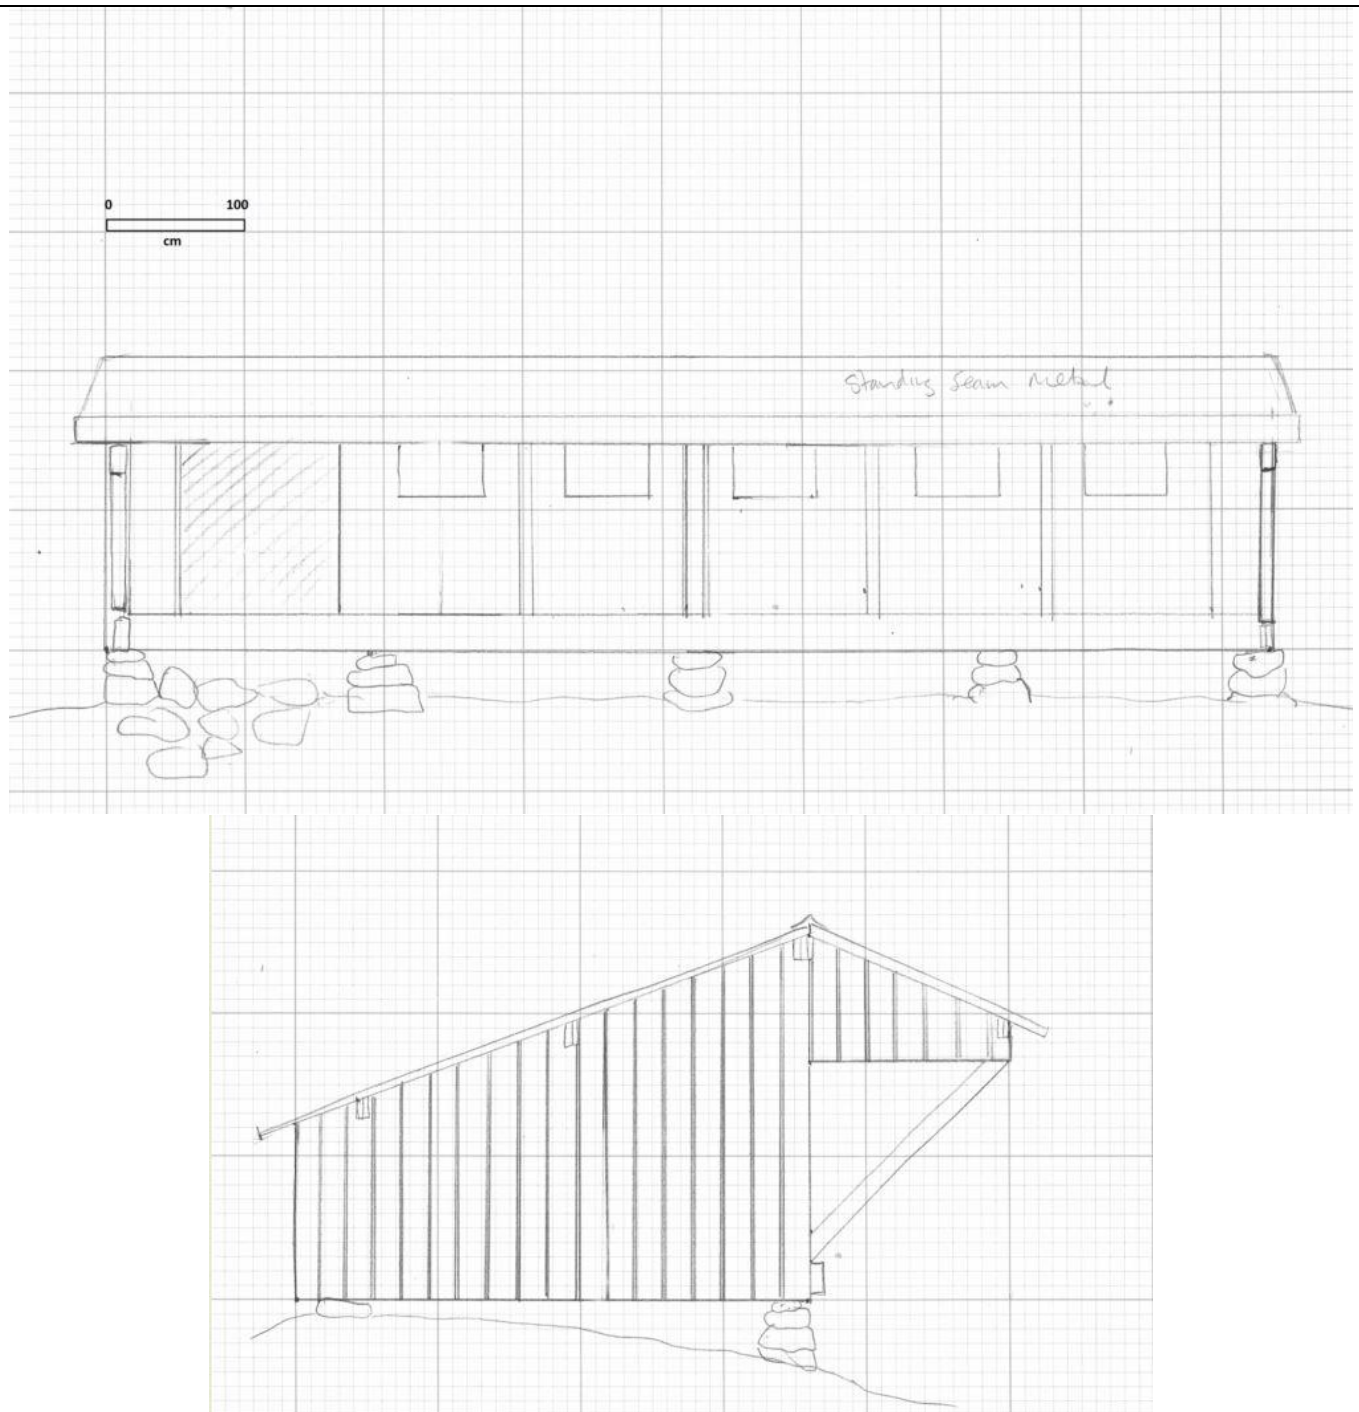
Hermit Lake No. 6 shelter drawings. Above: East (front) elevation. Below: South (side) elevation. August 17, 2011.
